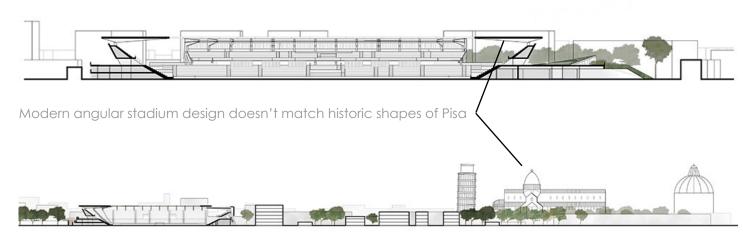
Pisa Section (IOTTI + PAVARANI, n.d.)
